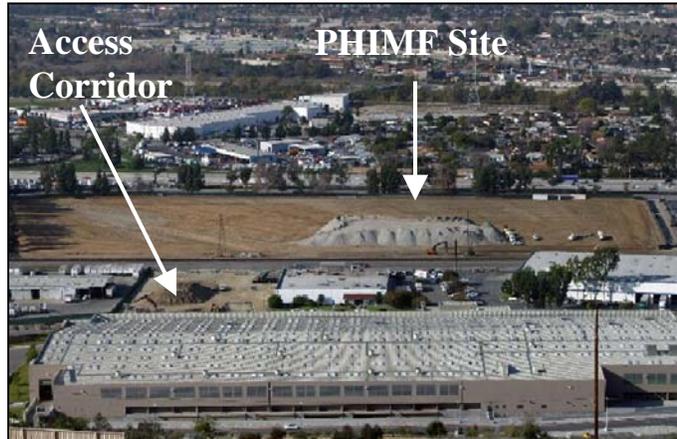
Buildings at PHIMF site and access corridor were demolished to facilitate construction of the access road and the PHIMF.
